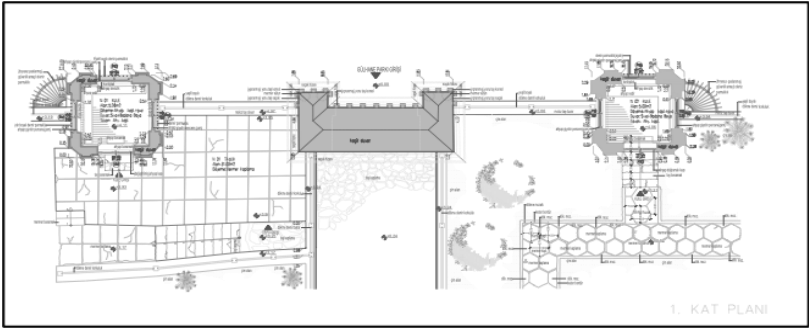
Mecidiye Gate Survey – First Floor (Author Archive, Bimtaş, 2009)
